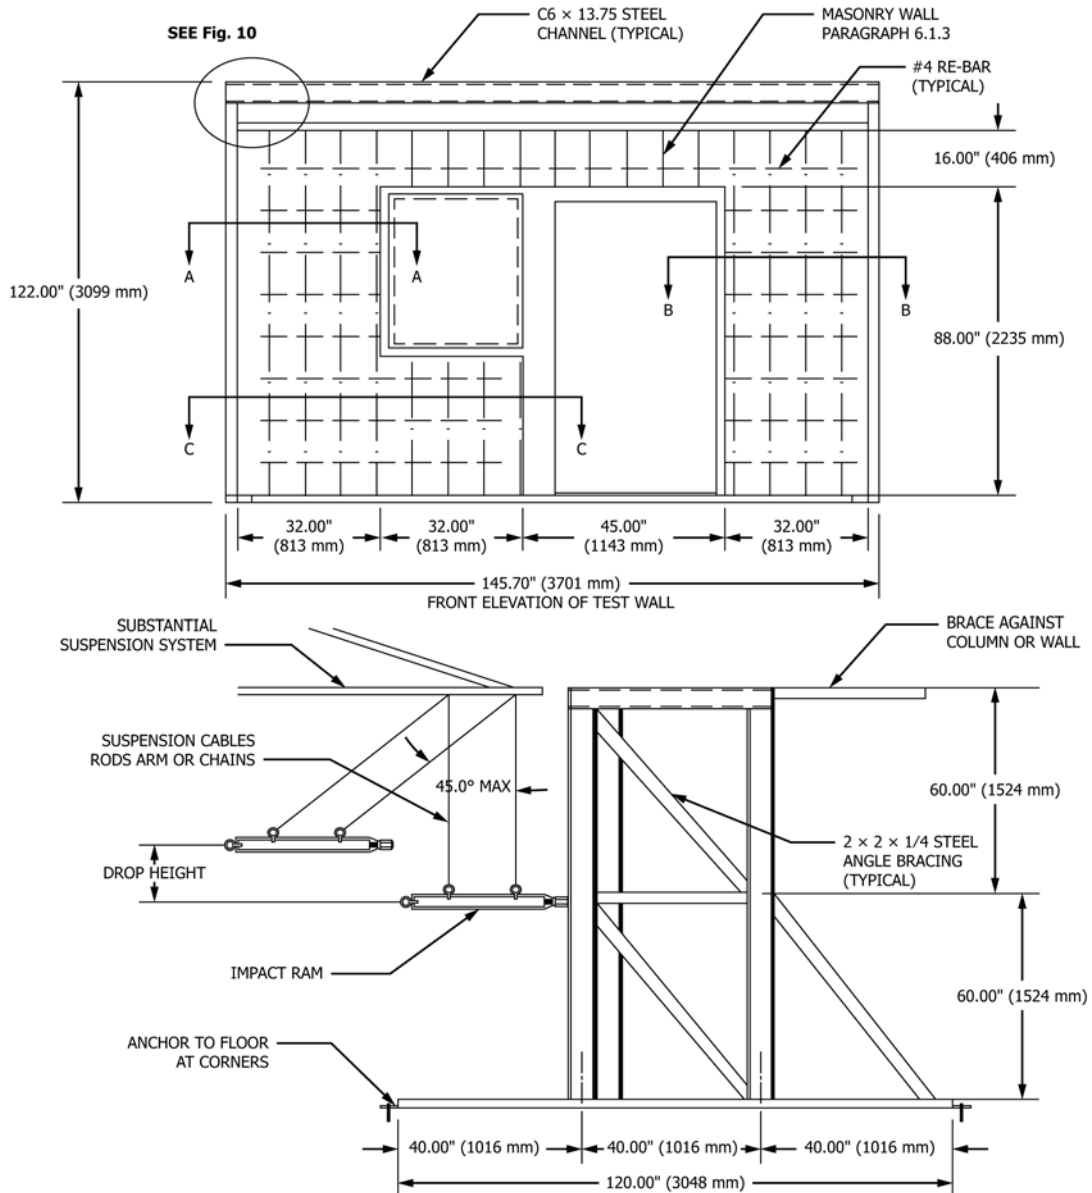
(Sidelight) Test Wall Detention Hollow Metal Anchor Systems (Test Method F1592 Sidelight)
